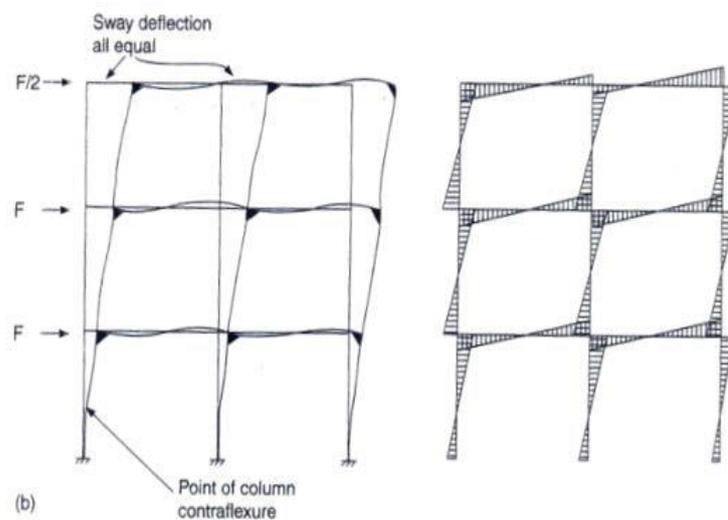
Moment Resisting Beam-Column Frame System (Hernandez and Cladera, 2011)
